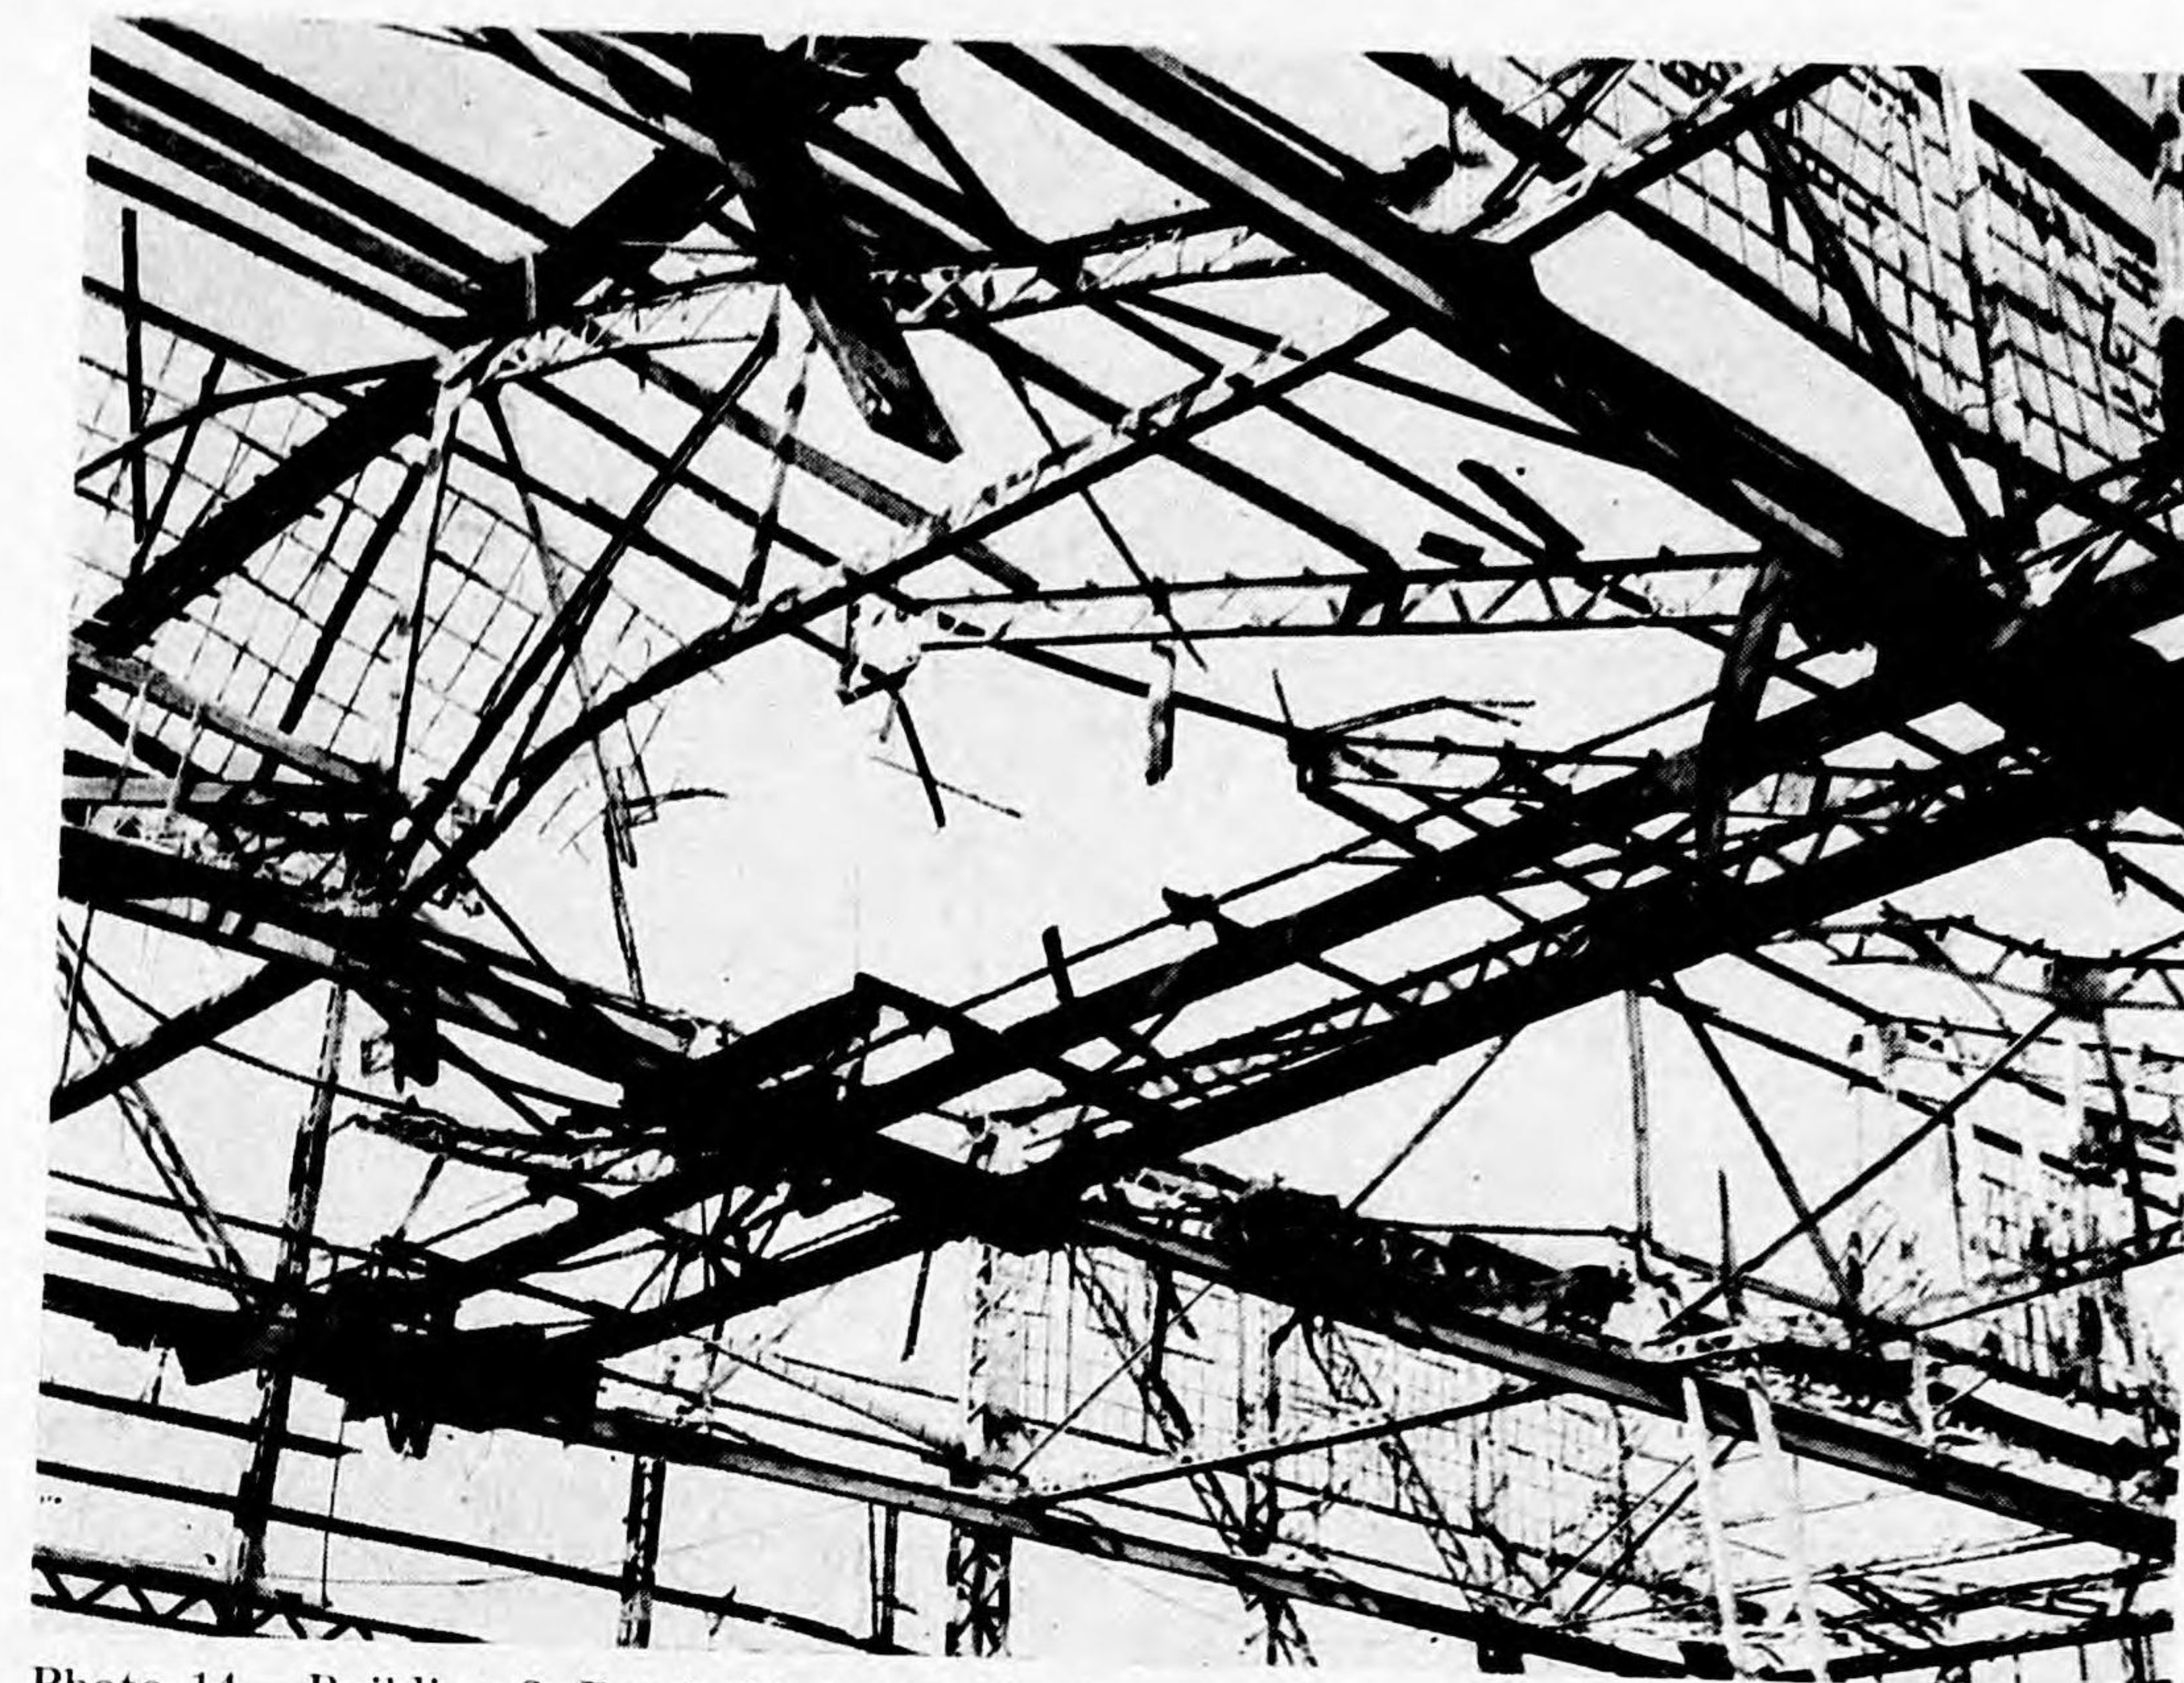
Building 3, Bomb 22; bomb hit above crane; roof damage; crane knocked down.
